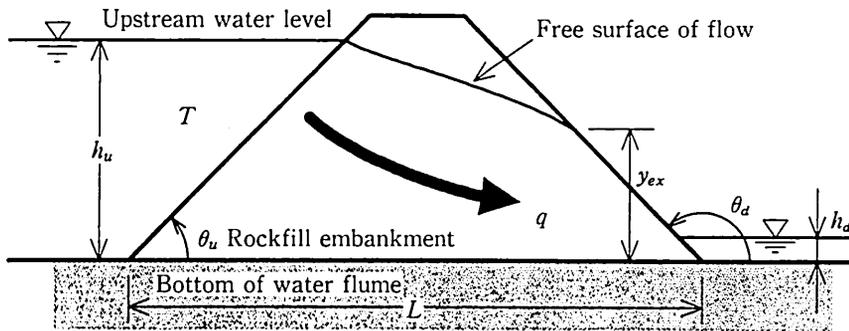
Rockfill embankment constructed in the laboratory water flume.
